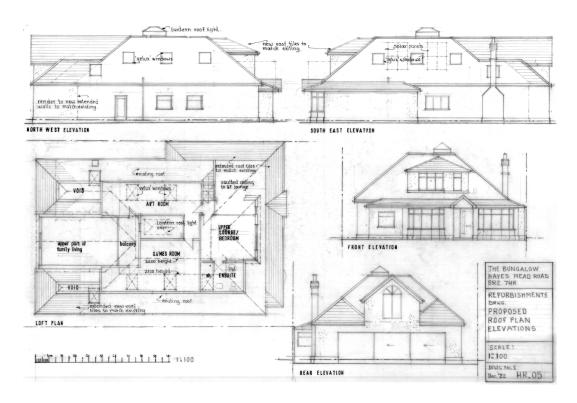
Elevations and loft plan of previously refused application (ref. 23/00790/FULL6)
